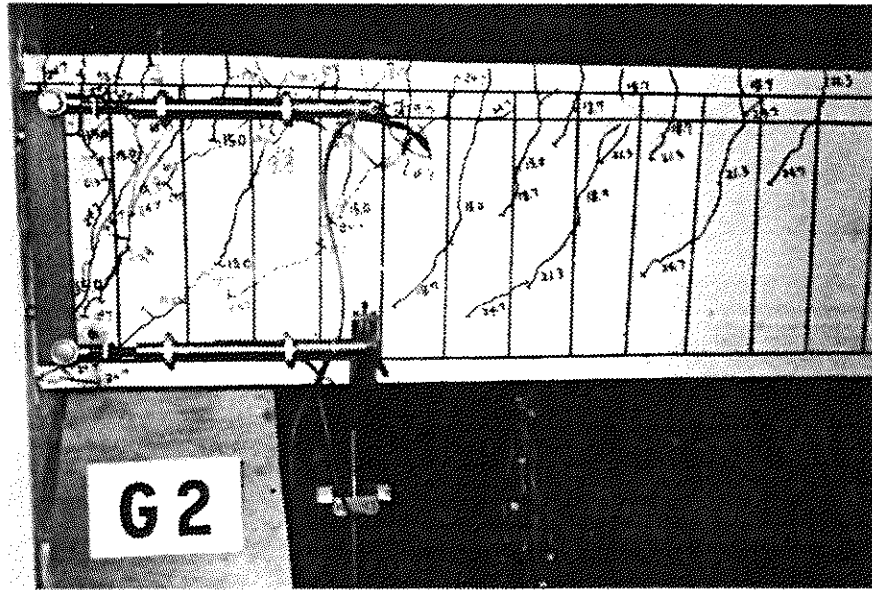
(a) Initial Crack Pattern, Beam G-2
